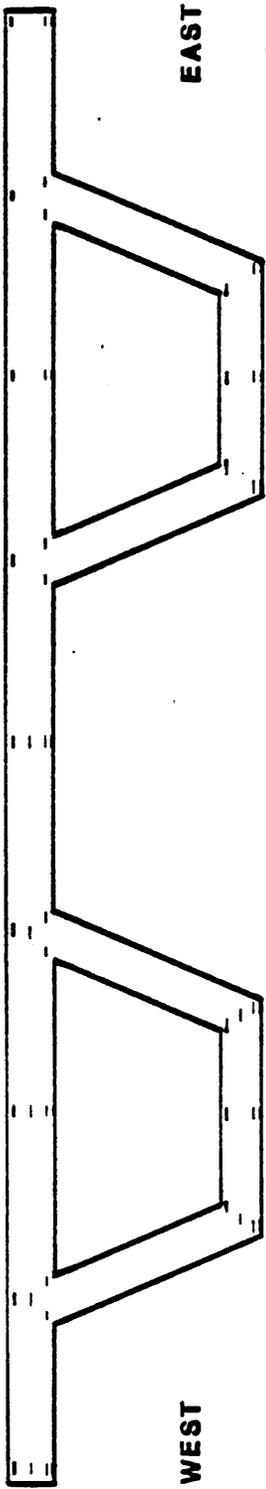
(a) Type T thermocouple locations in twin box girder sections.
